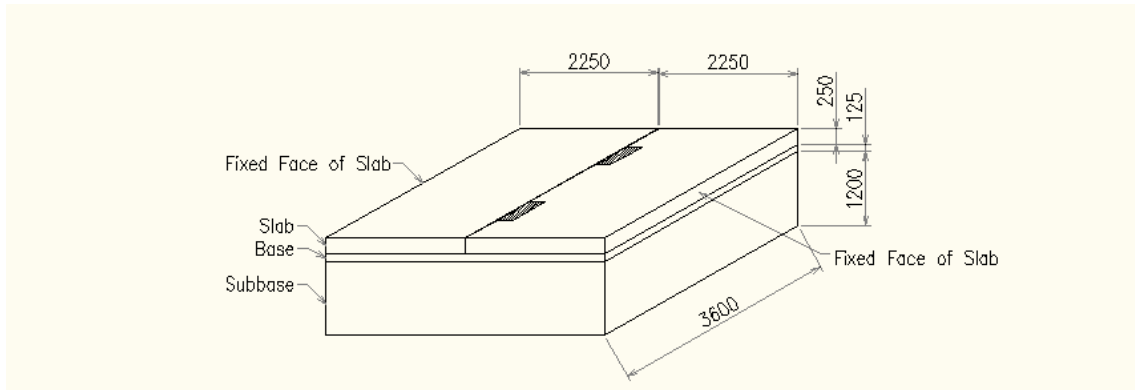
Half Slab Model Geometry (12 dowels, 300 mm spacing)
